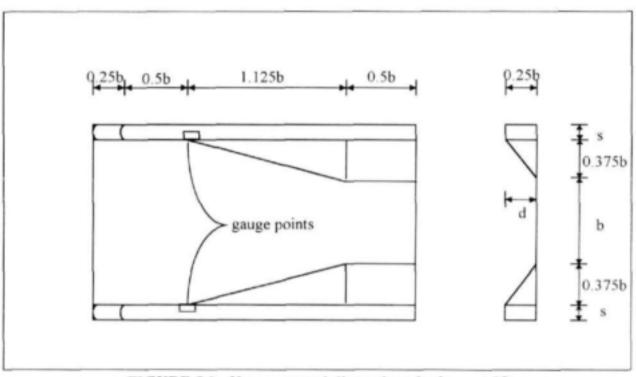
New proposed dimensions for lay-out 3S
